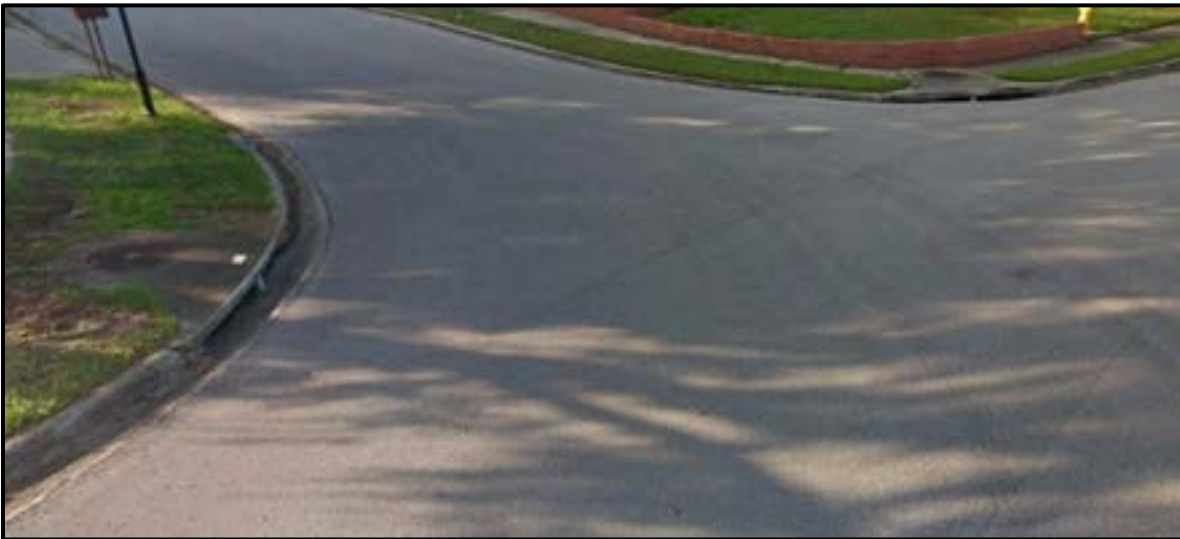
Existing Curb Inlets at the Intersection of Lonesome Pine Drive and Knollcrest Drive
